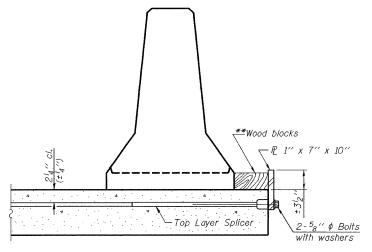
Detail II - With Extended Reinforcement Bars: Connect one (1) 1"x7"x10" steel P to the concrete slab or concrete wearing surface with 2-58"\$ Expansion Anchors or cast in place inserts spaced between the top layer of reinforcement at approximate € of each barrier panel.
